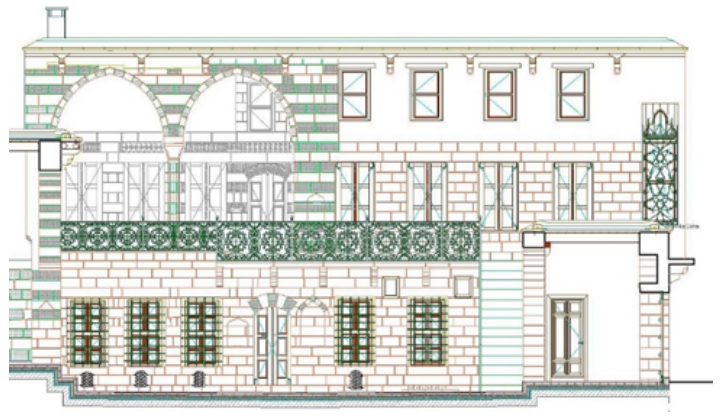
Analytical survey of the south façade of the building facing the courtyard
